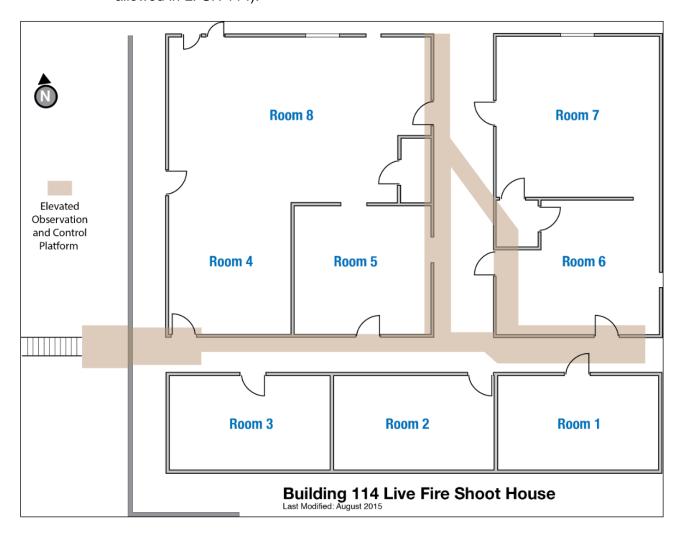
Layout and Features of Building 114 Live Fire Shoot House
